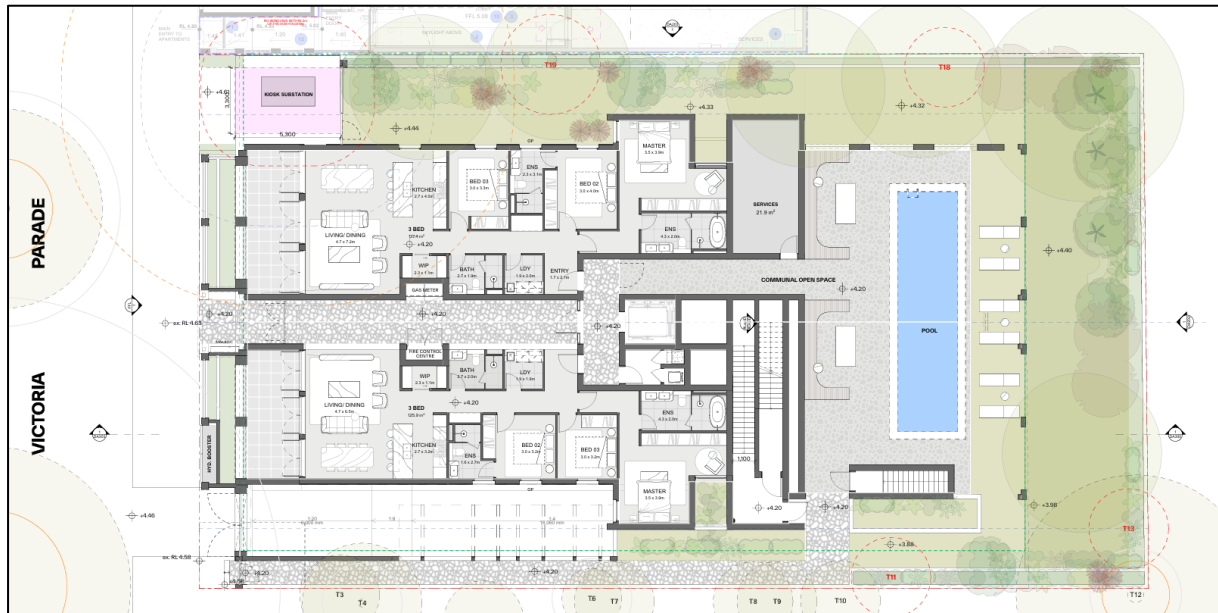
Floor Plan for Ground Floor (Source: PBD Architects, 2026)
